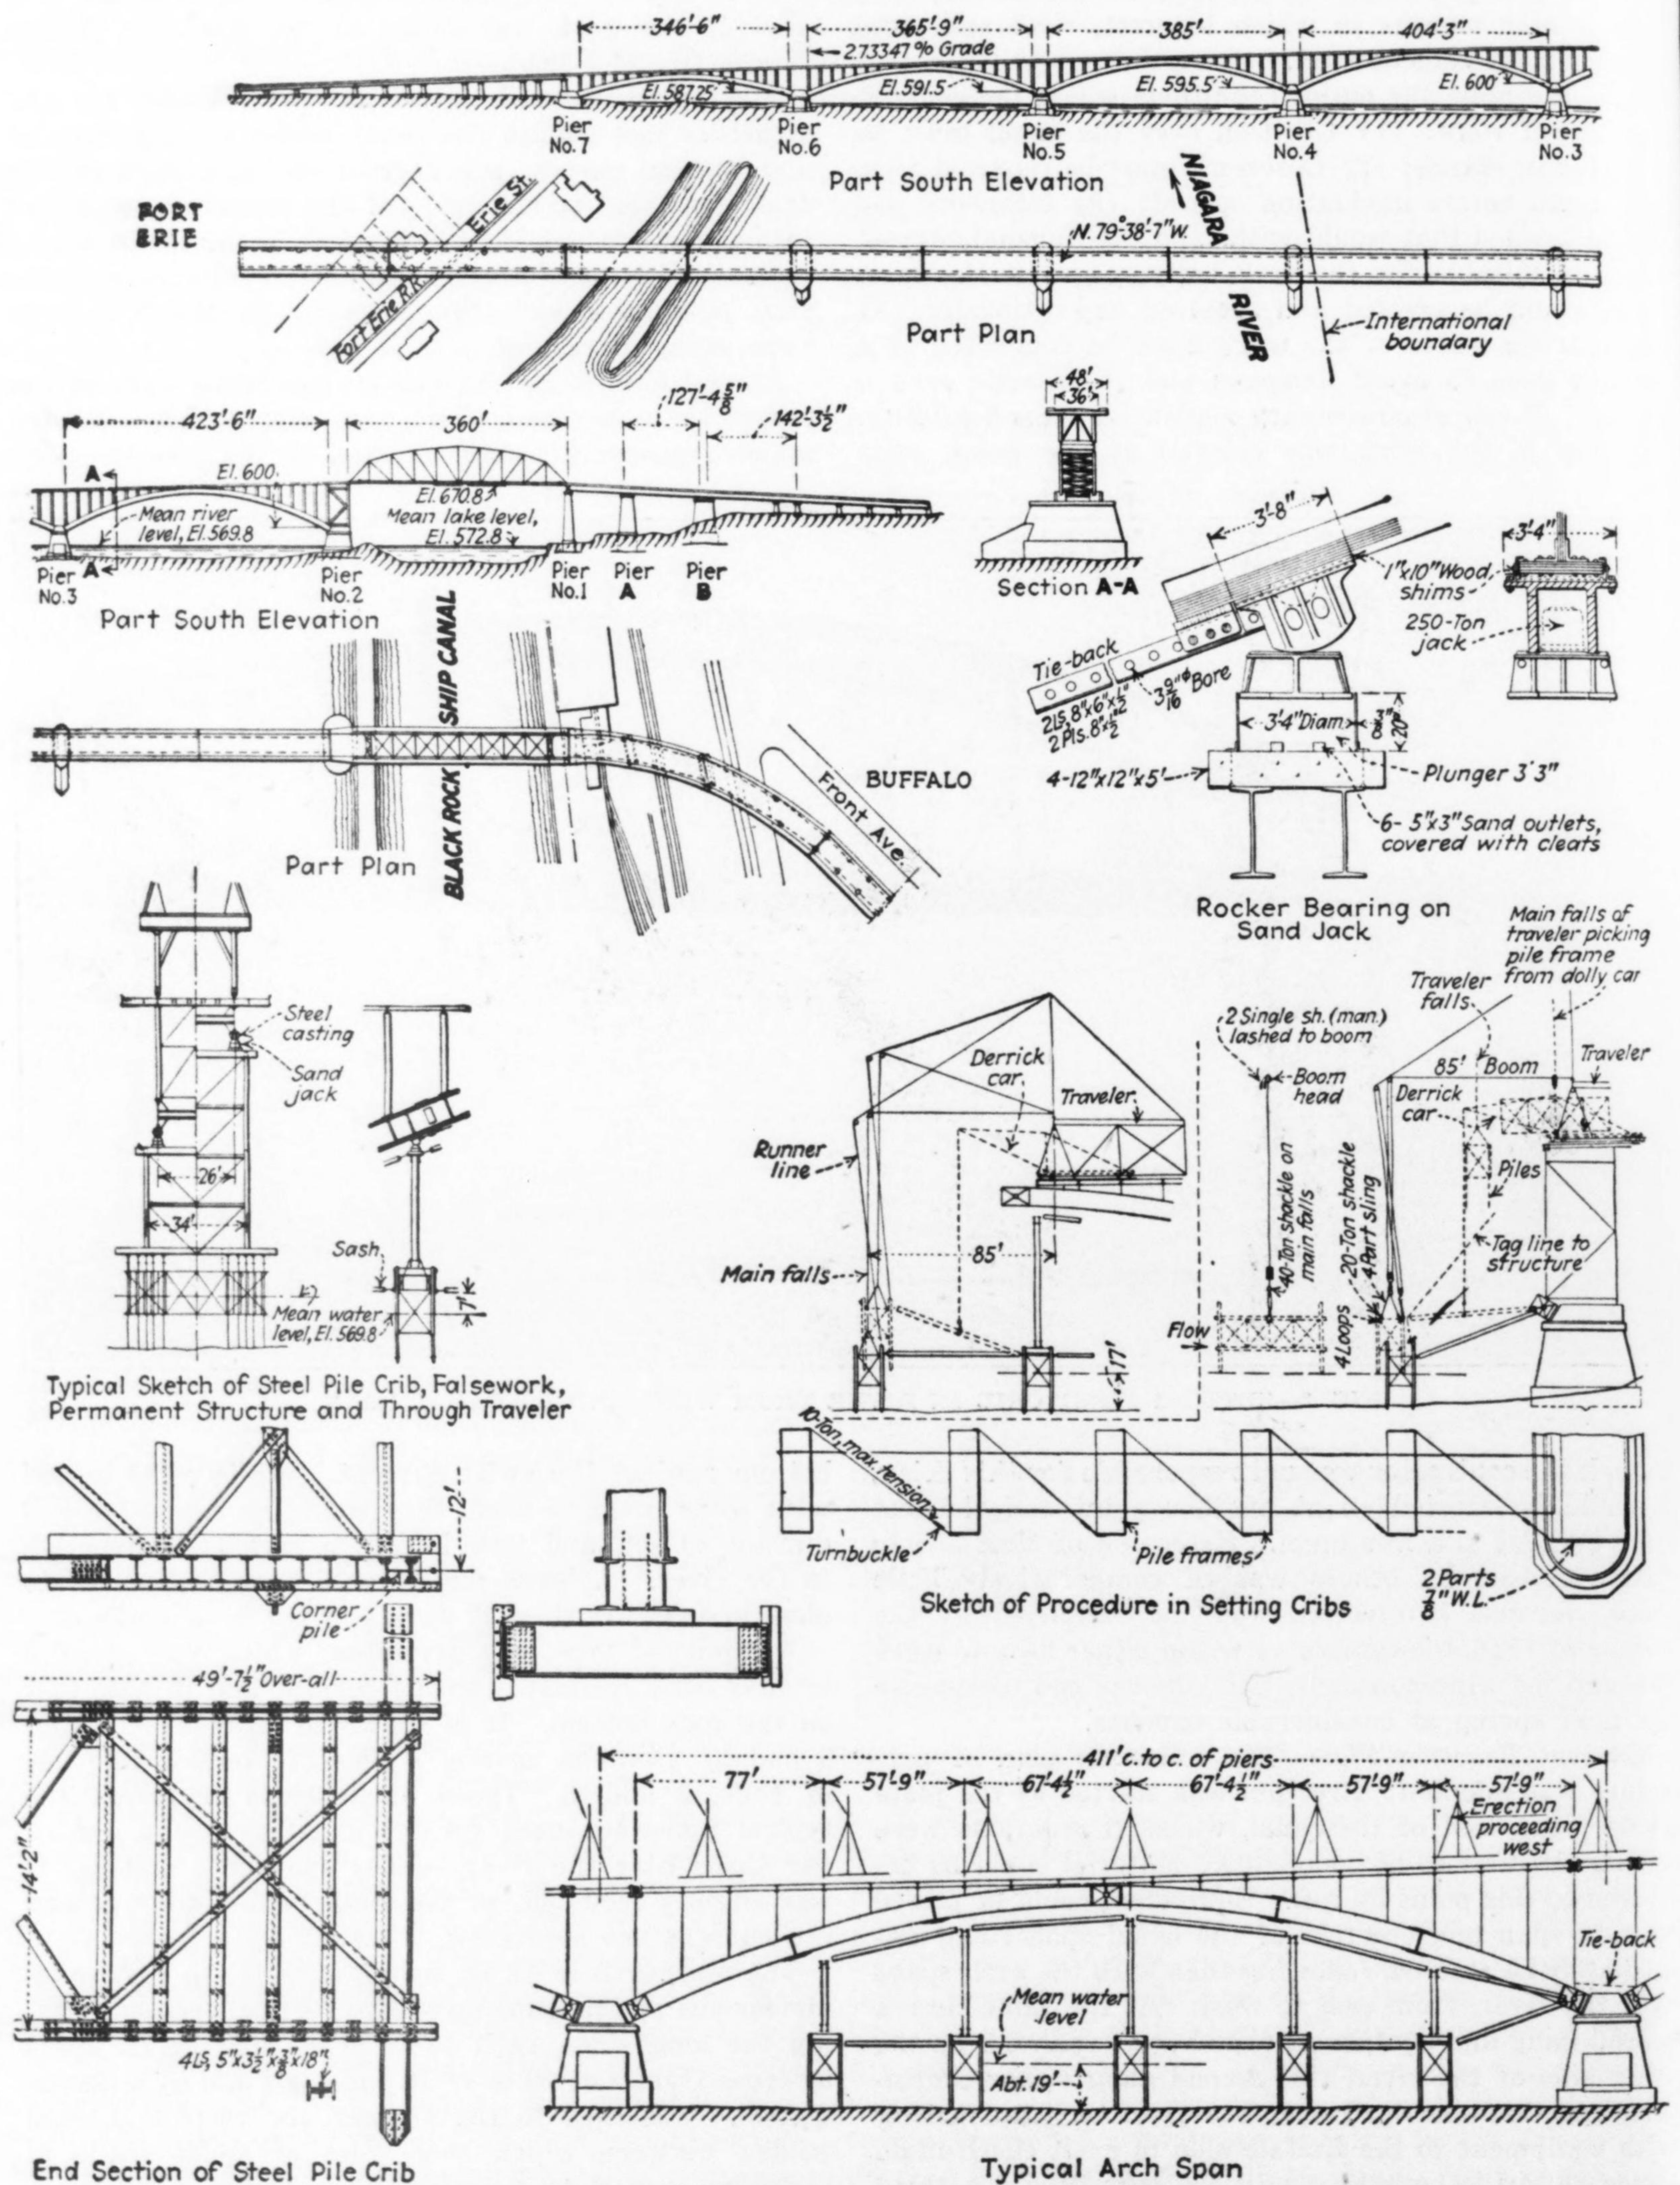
THE PEACE BRIDGE AND SOME FEATURES OF ITS ERECTION EQUIPMENT
